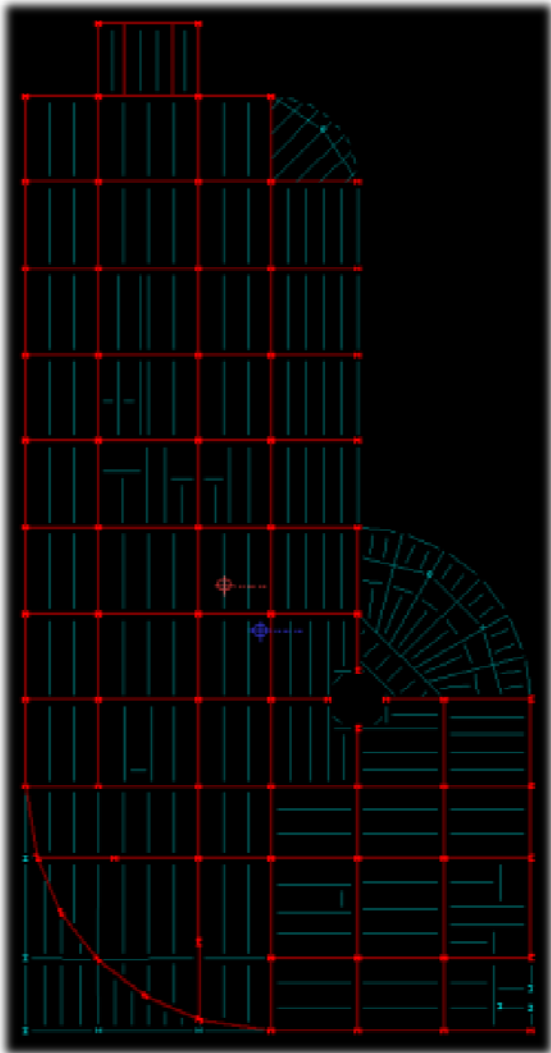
Center of Mass and Rigidity for 1st and 2nd Floor
